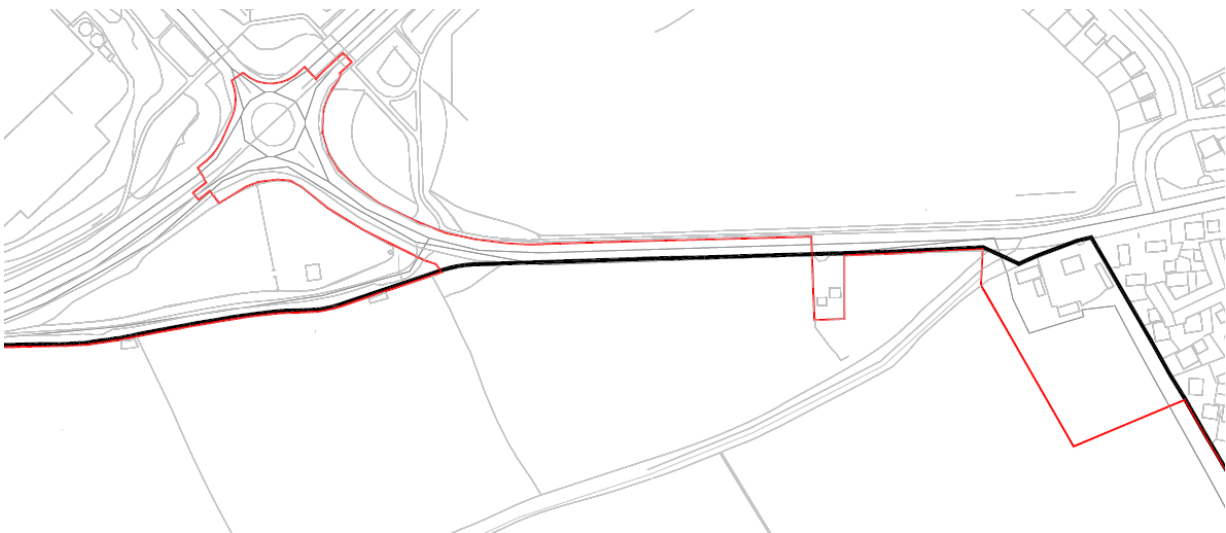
Tattenhoe Roundabout / Buckingham Road (MKC point of access)
